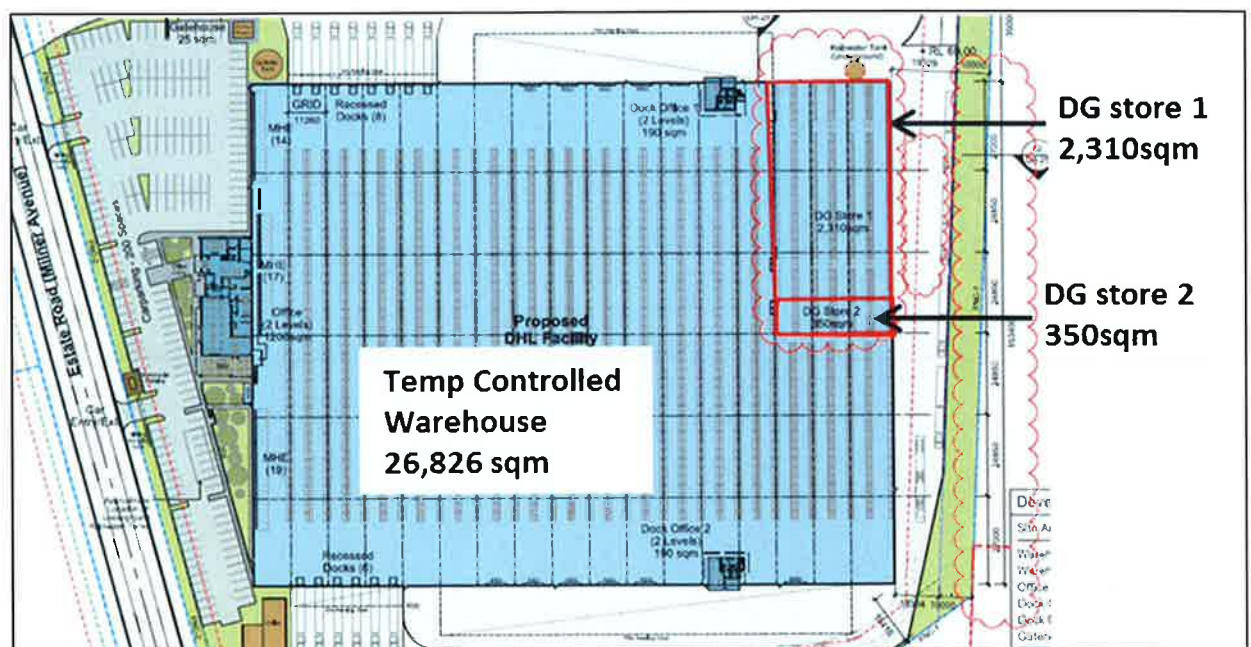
Proposed layout of Unit 2B for proposed DHL Facility
